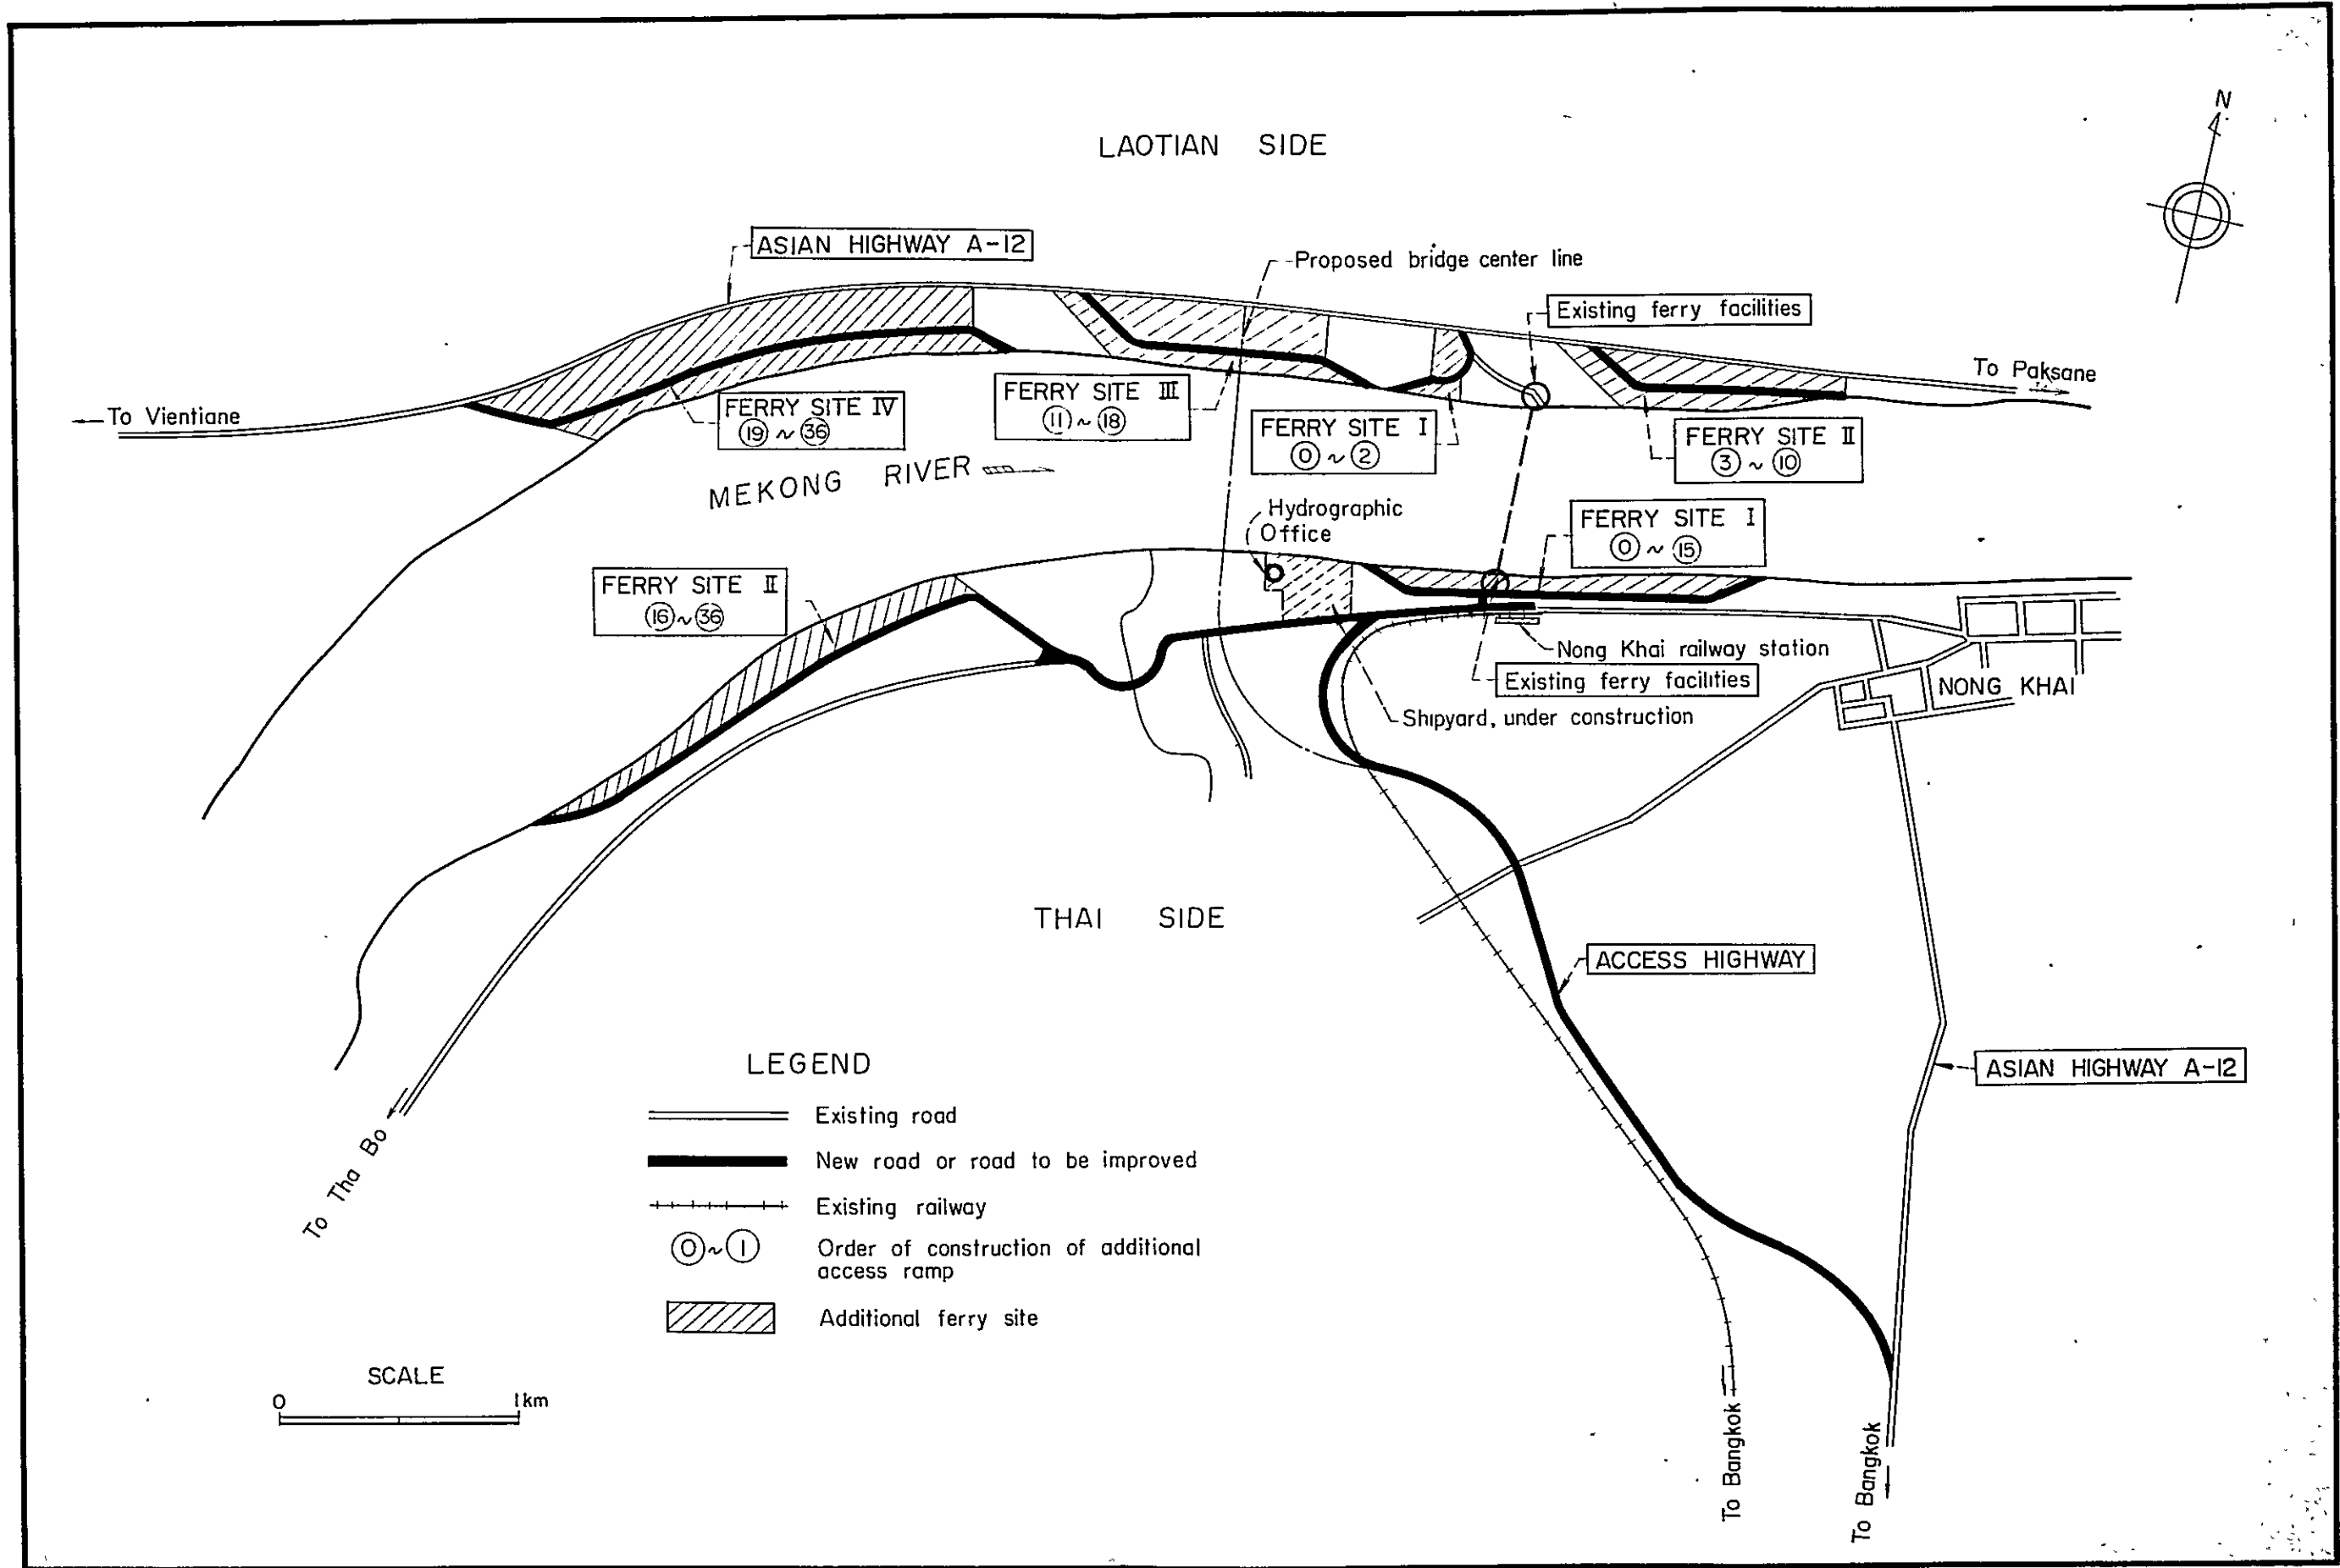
GENERAL LAYOUT OF ADDITIONAL FERRY FACILITIES
